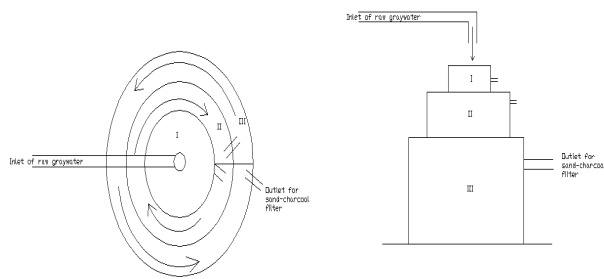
Plan and Elevation showing 'Circumferential sedimentation tank'
